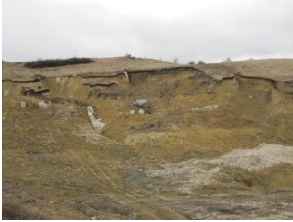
Example 1 – new landfill site – insufficient geotechnical and hydrogeological investigation
